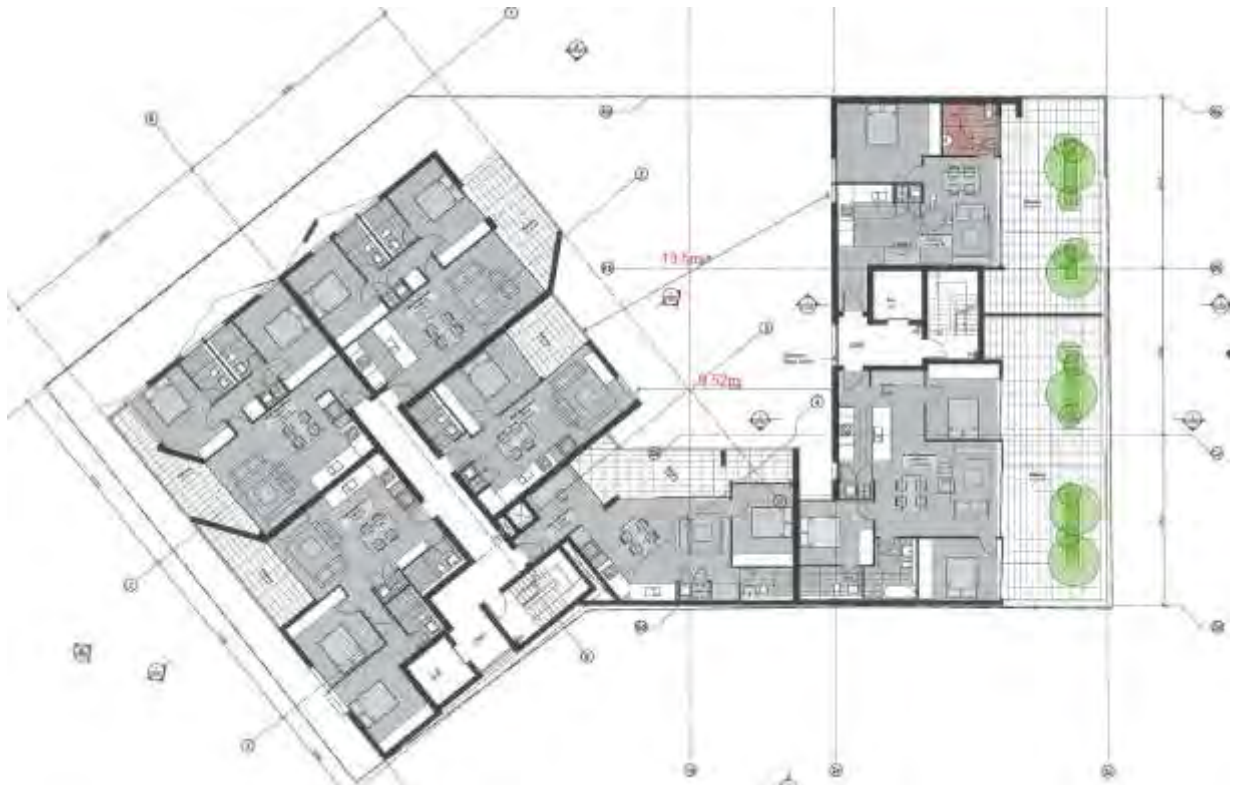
Typical floor layout of the development. The separation distances between the buildings achieve the requirements of the Residential Apartment Guide.
